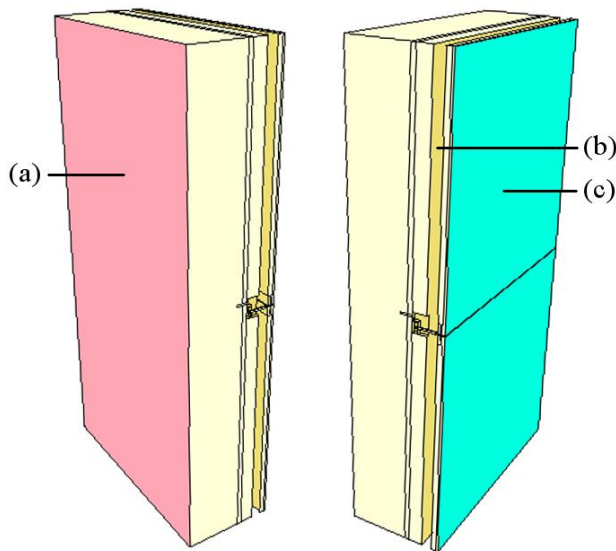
Internal and external view of three-dimensional thermal model of assessed ventilated façade system. Boundary conditions: (a) interior, (b) ventilated cavity, (c) exterior.
